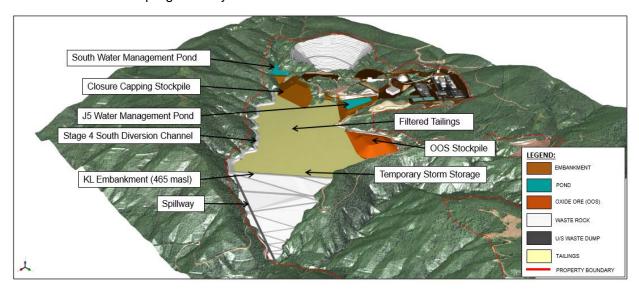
Phase 1 IWMF Site Layout (Year 10)
